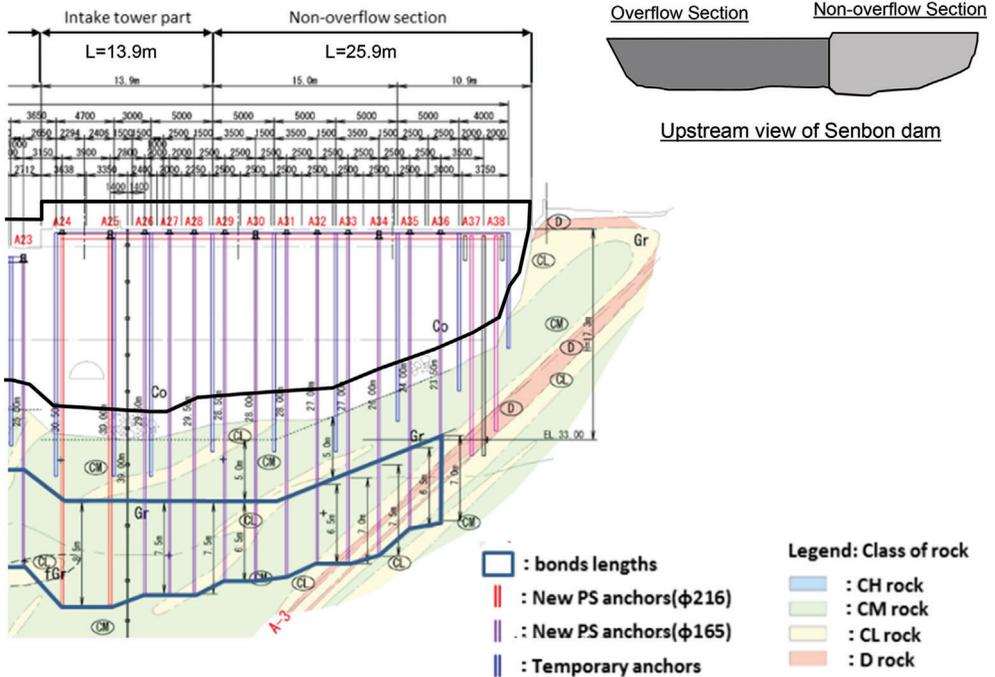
Longitudinal profile of Dam axis on layout of post tensioned anchors from upstream
